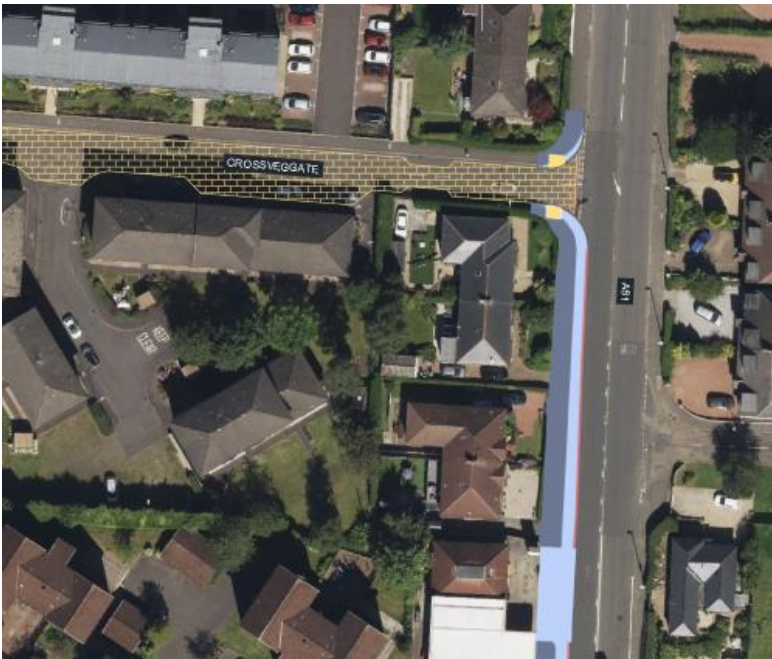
Crossveggate quiet street and A81 Glasgow Road shared-use footway.
